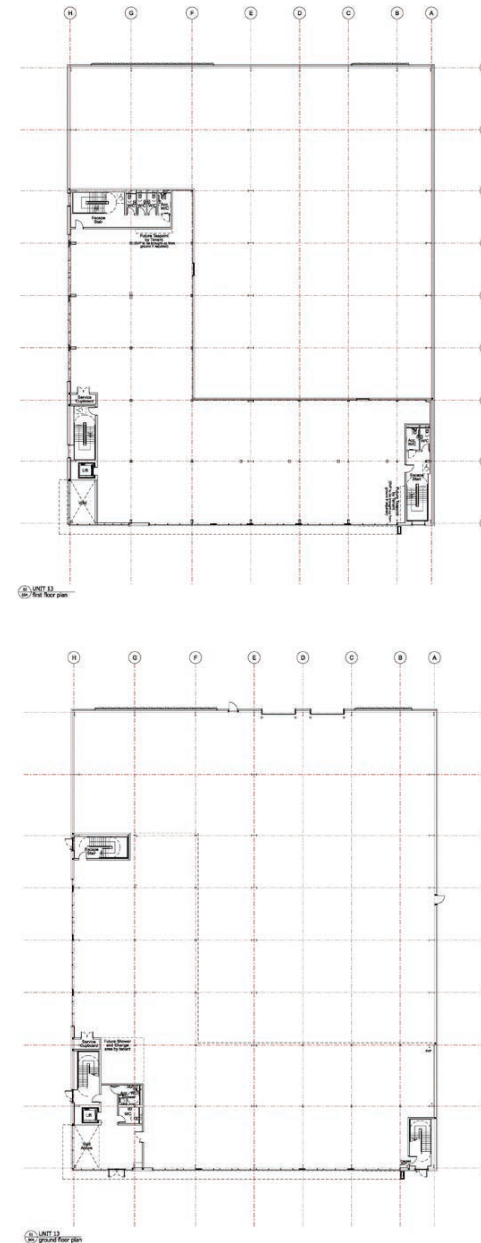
PROPOSED UNIT 3 GROUND AND FIRST FLOOR PLANS
